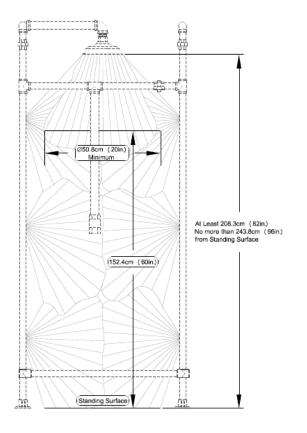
Emergency Shower – Multi-Nozzle with Overhead Fixture
